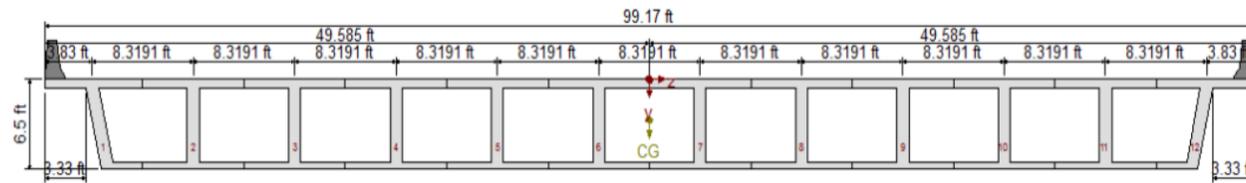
Bridges on SB and NB SR303L Frontage Road - Typical Section
